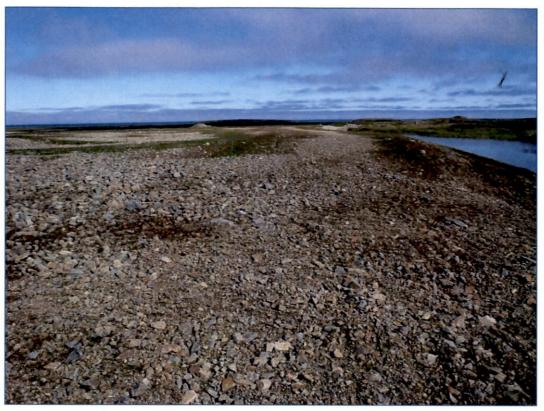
Site 9 Landfill – East side of landfill, facing north.
